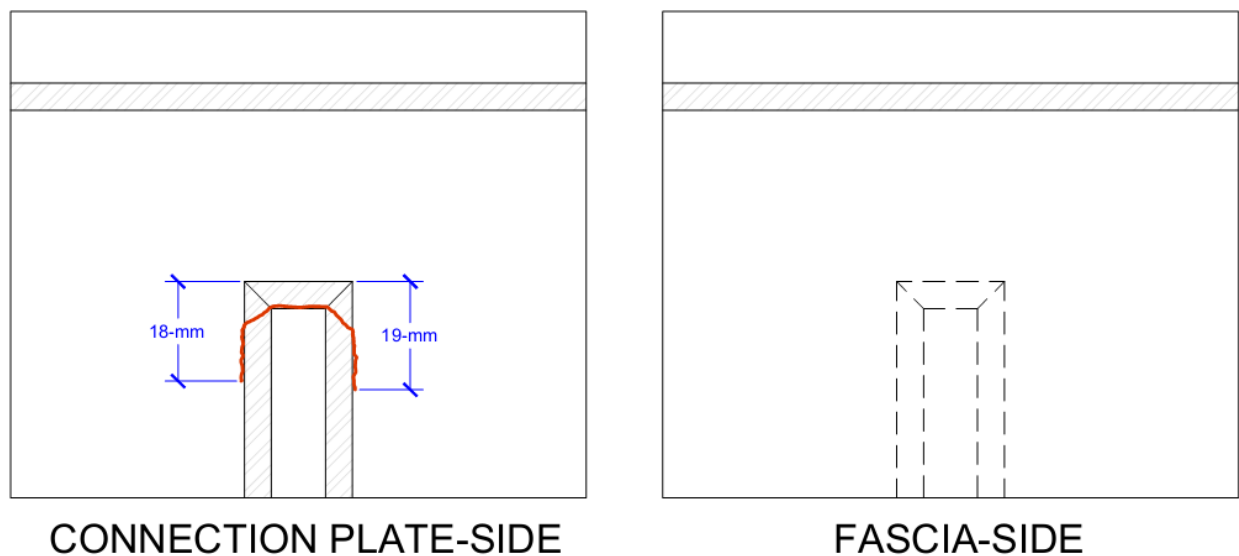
Final observed crack growth after 150,000 cycles on north girder of 9.1-m (30-ft) test bridge
